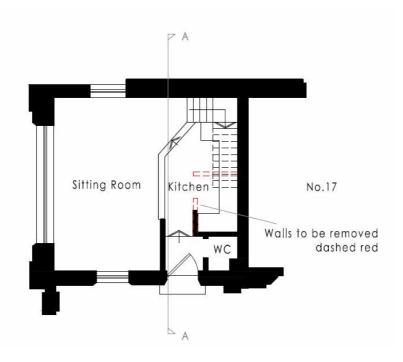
Extract from drawing no: 1803/P-02 –proposed ground floor plan
